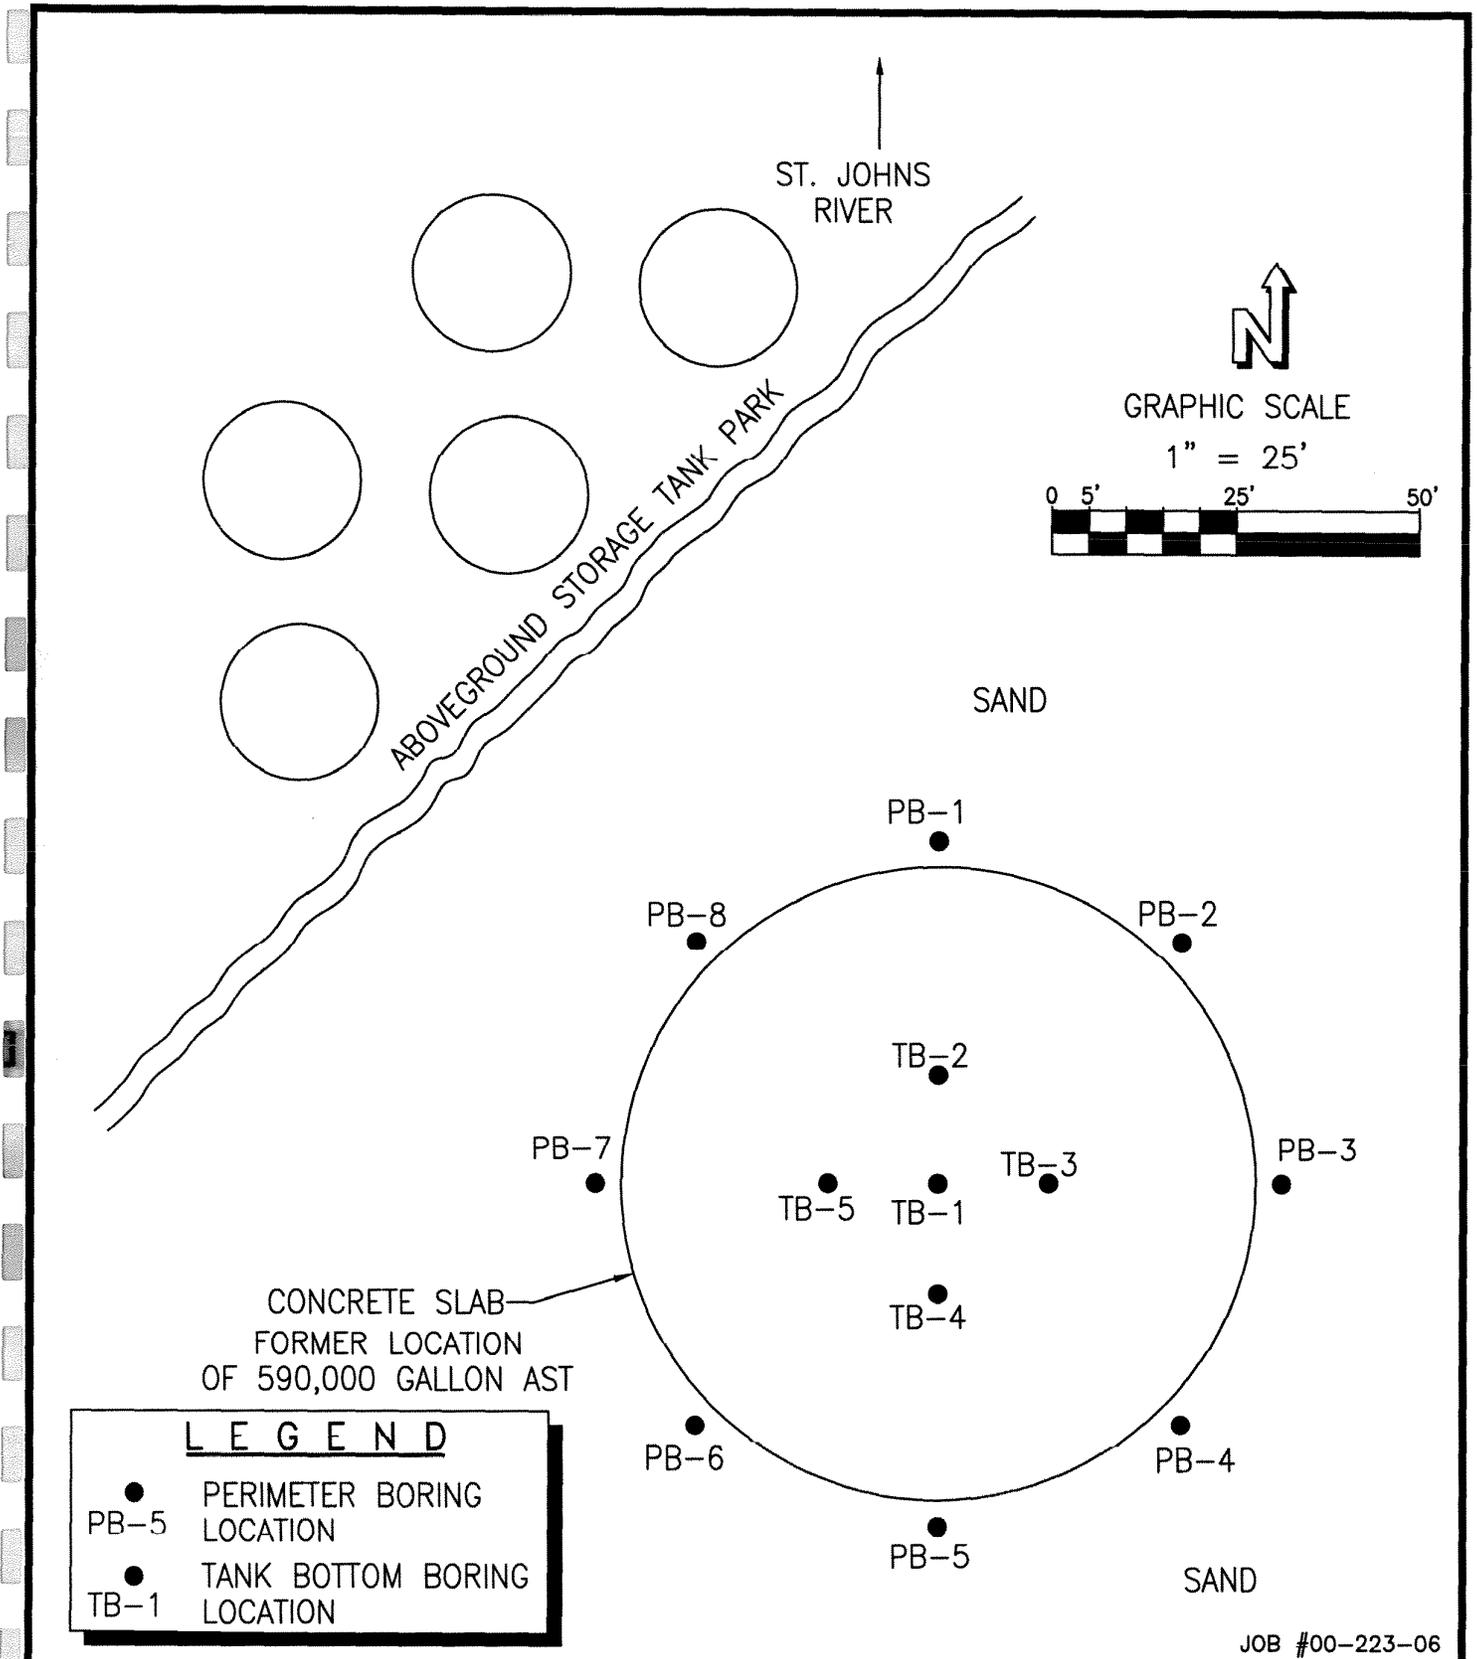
SITE PLAN AND SAMPLING LOCATIONS
